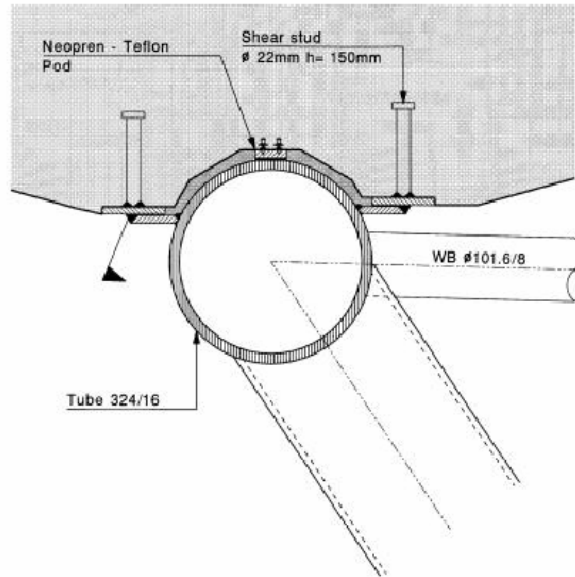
Concrete Slab to Steel Truss Top Chord Connection Detail
